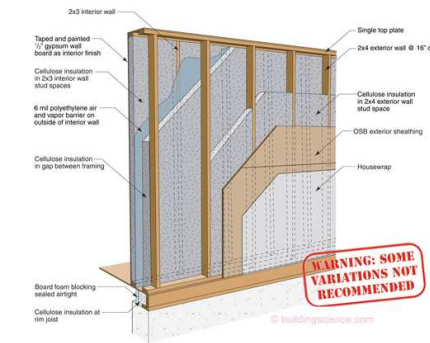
Double-stud wall construction (Source: Building Science, 2009)
